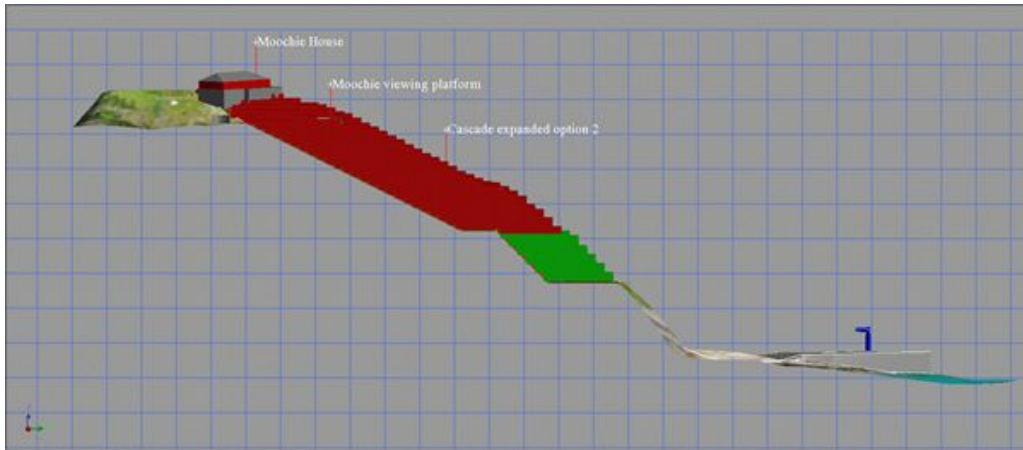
Sectional View from south to north, indicating how excavation would compromise the House
